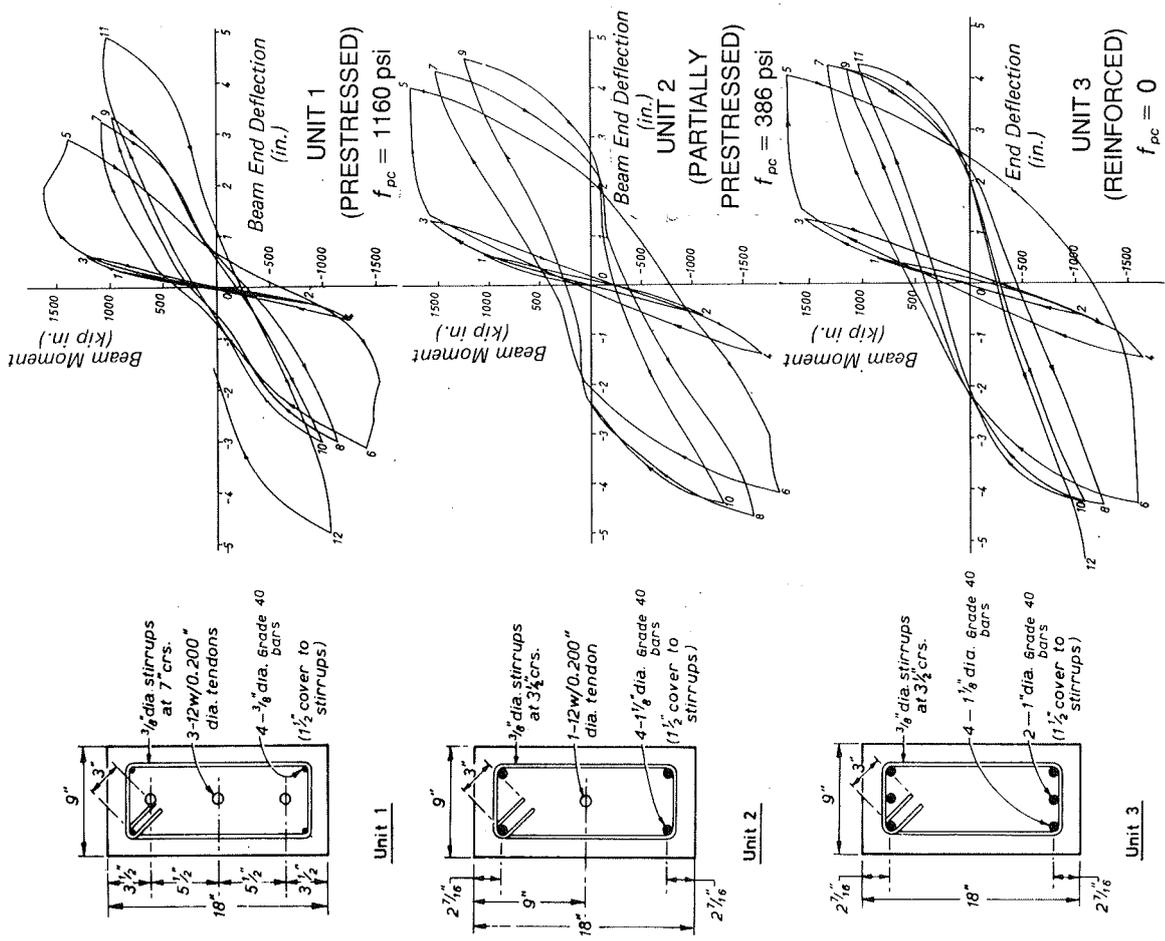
EFFECT OF BEAM PRESTRESSING LEVEL ON HYSTERETIC BEHAVIOR OF BEAM-COLUMN SUBASSEMBLAGE [147, 148]
